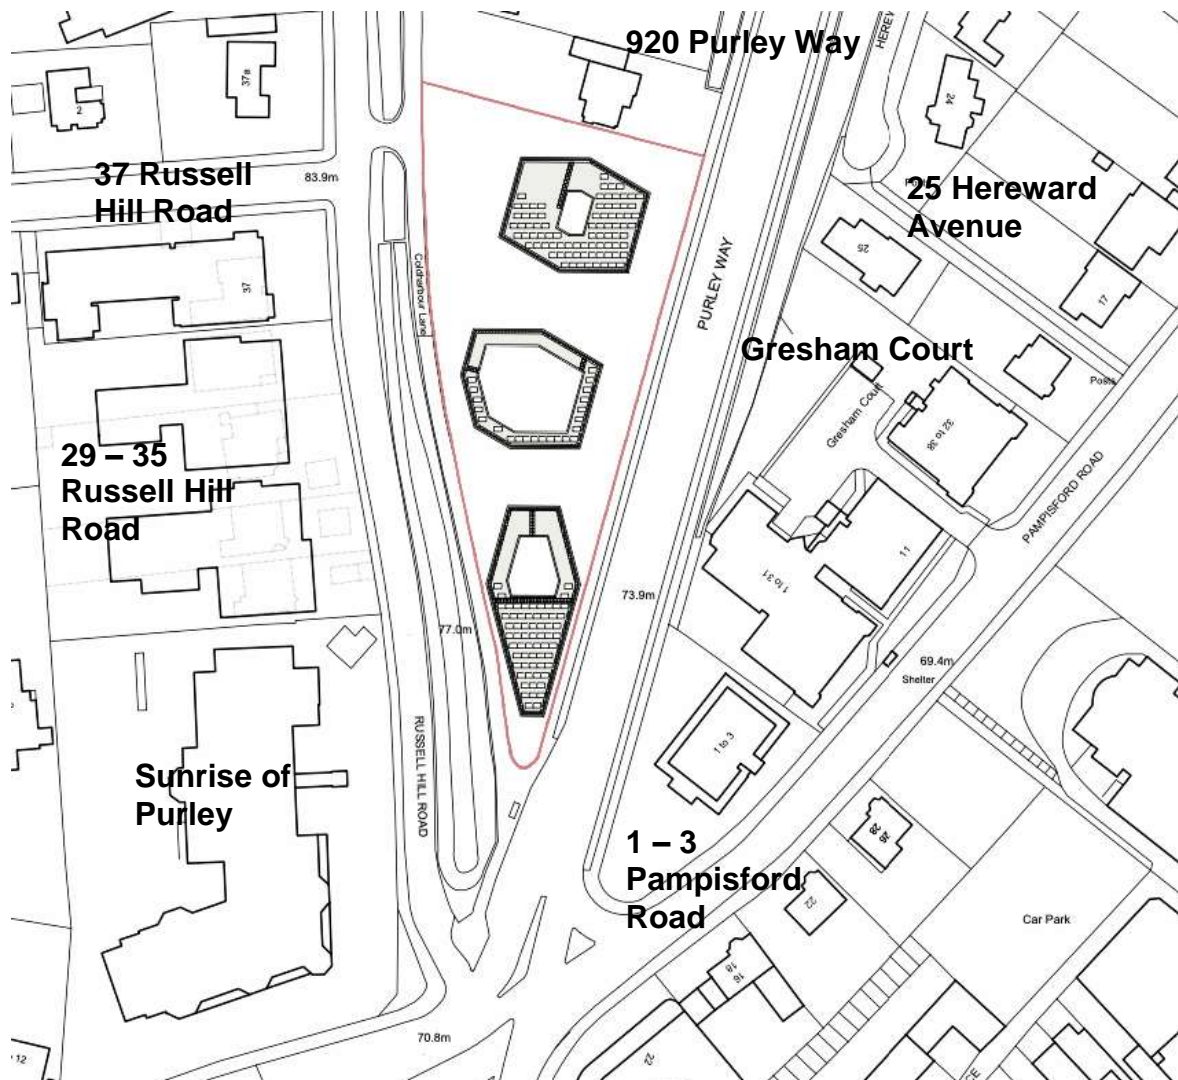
Proposed Site Plan with adjoining occupiers highlighted.
